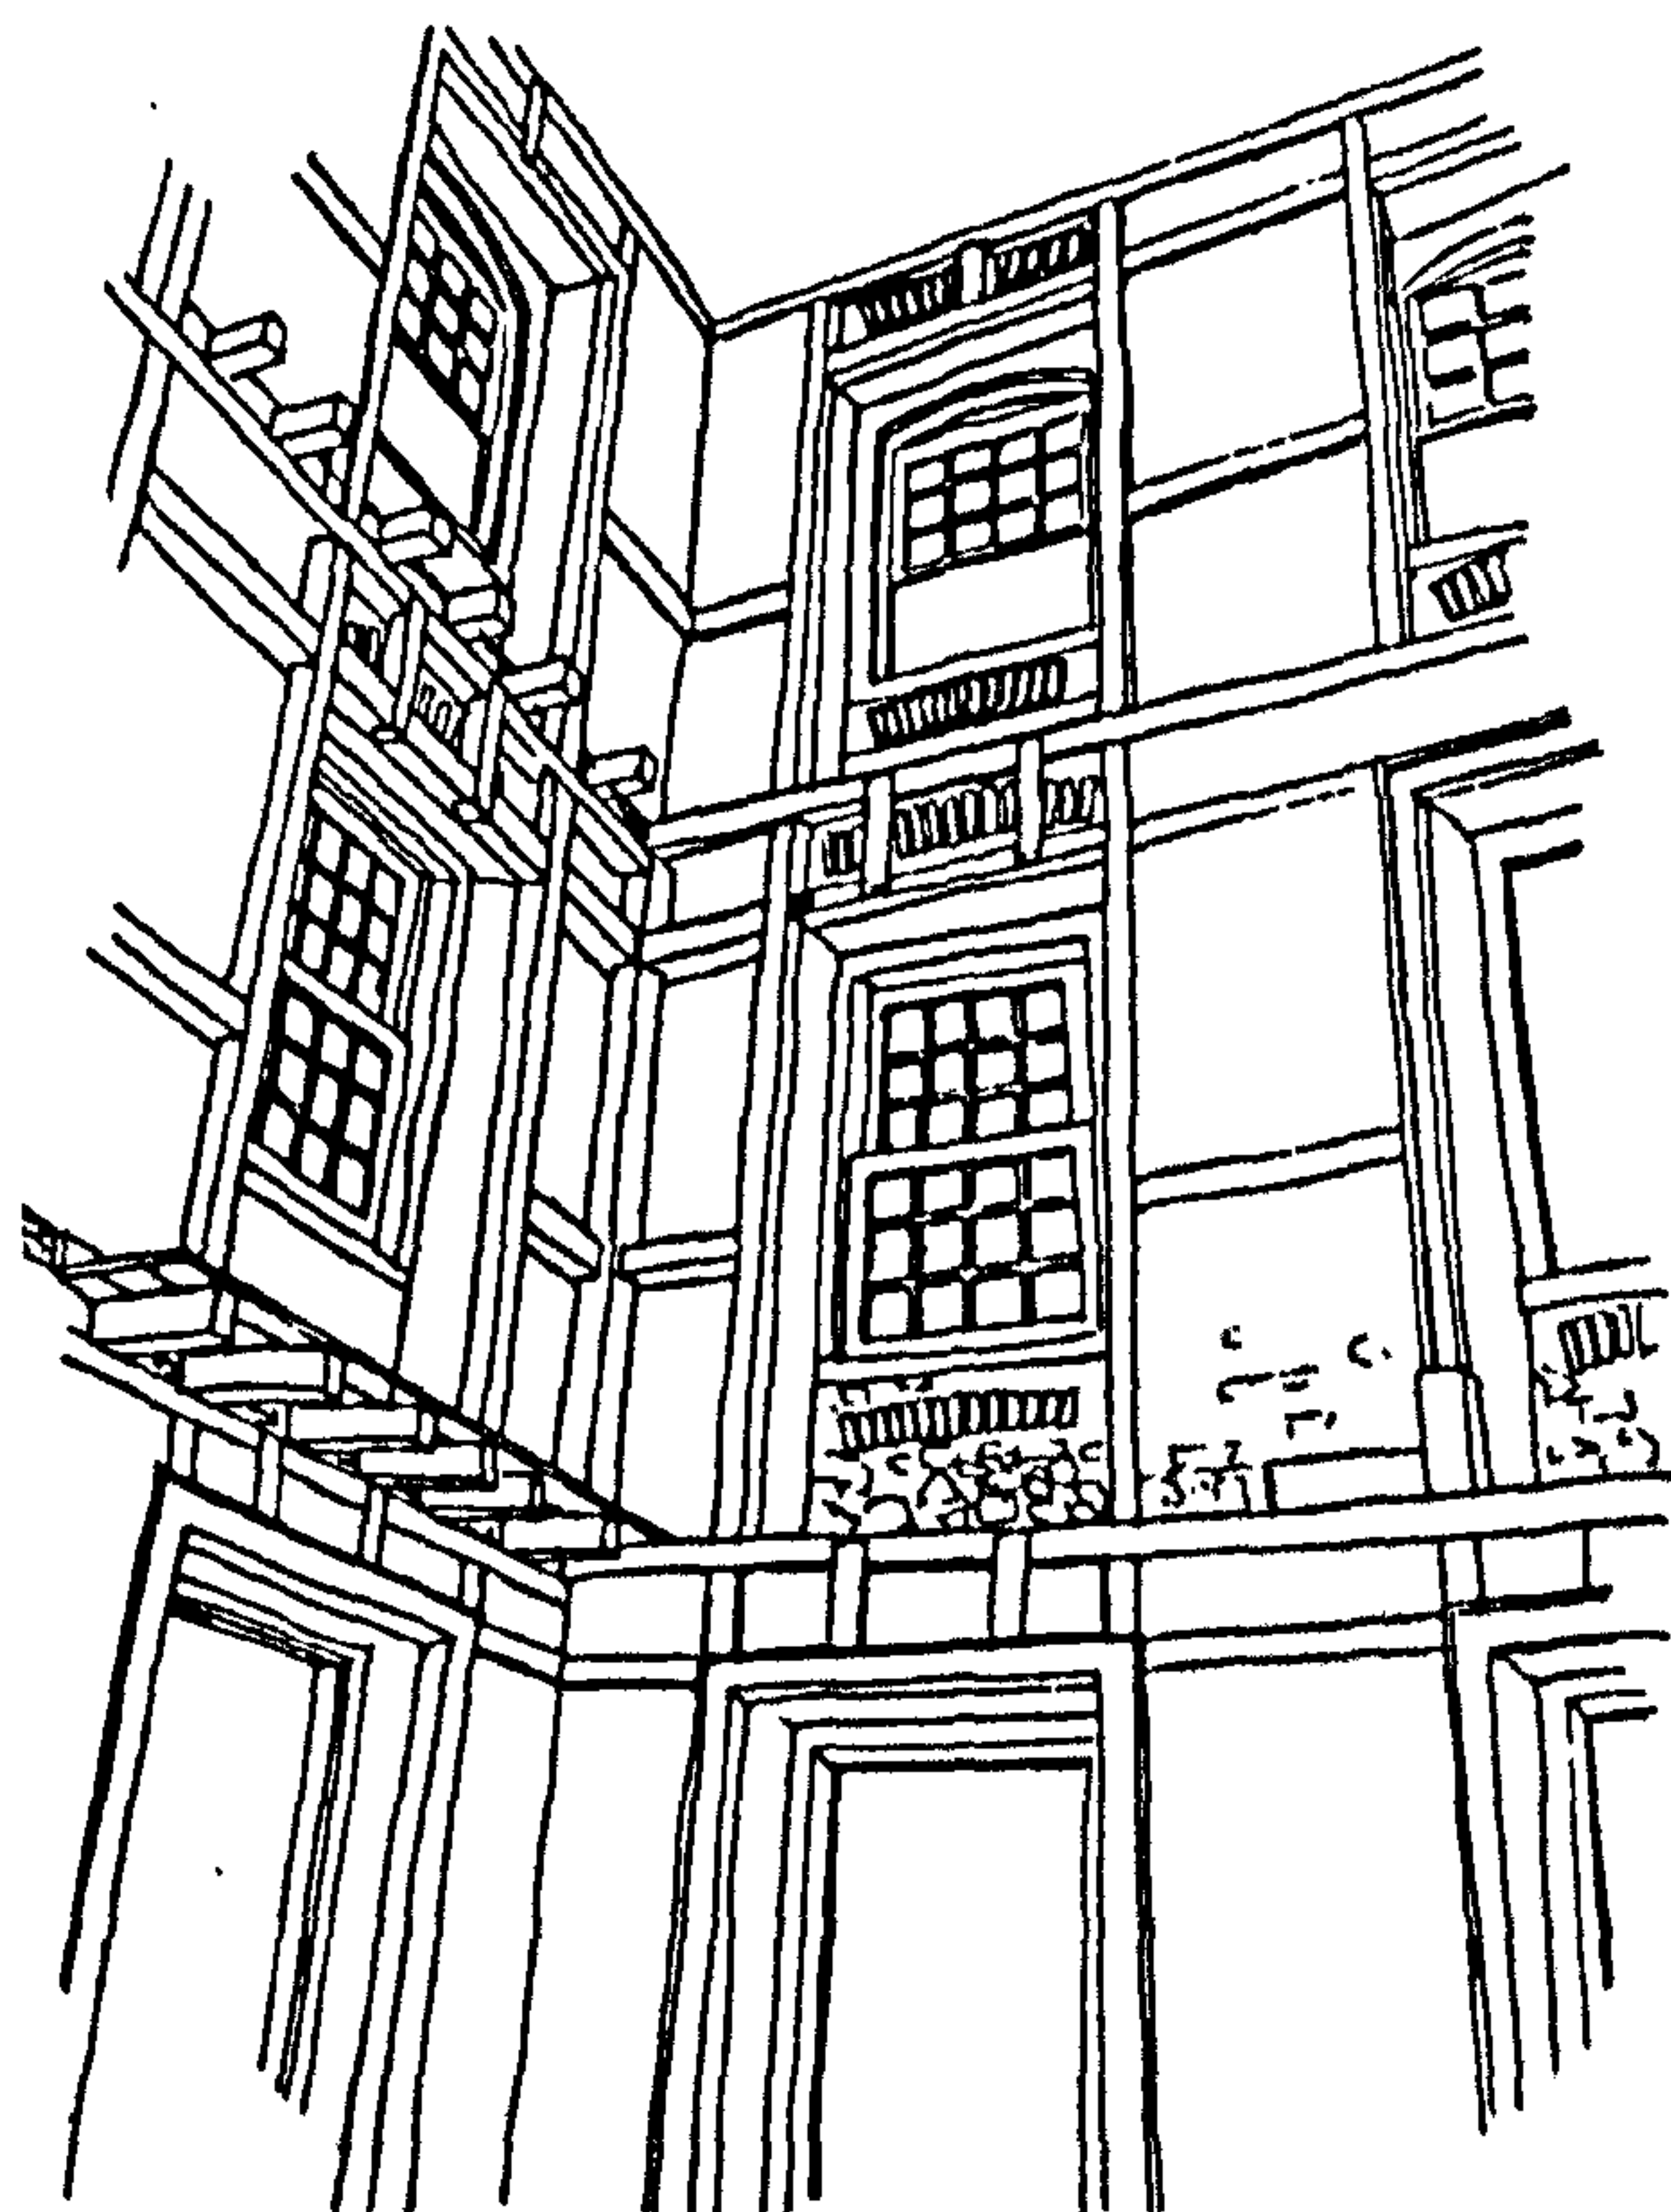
The wooden cage structure on the inside face of the external wall façade (corner).
